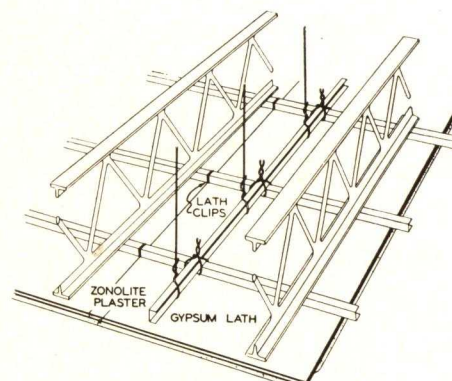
Hung ceiling Zonolite Plaster on Gypsum Lath.
